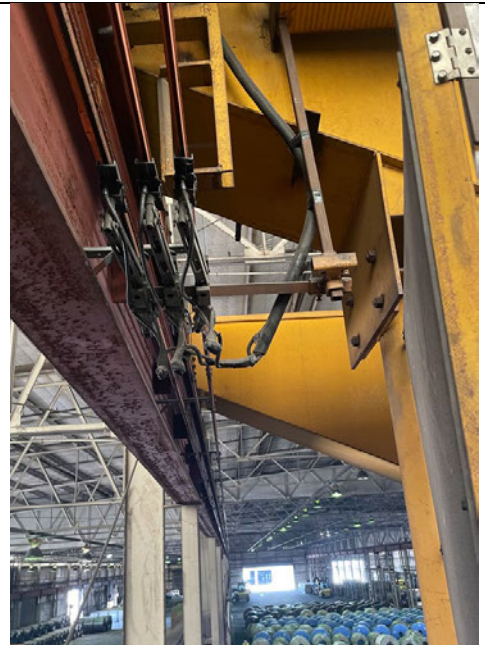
Close up showing how crane commutators connect to busway on side of support beam
